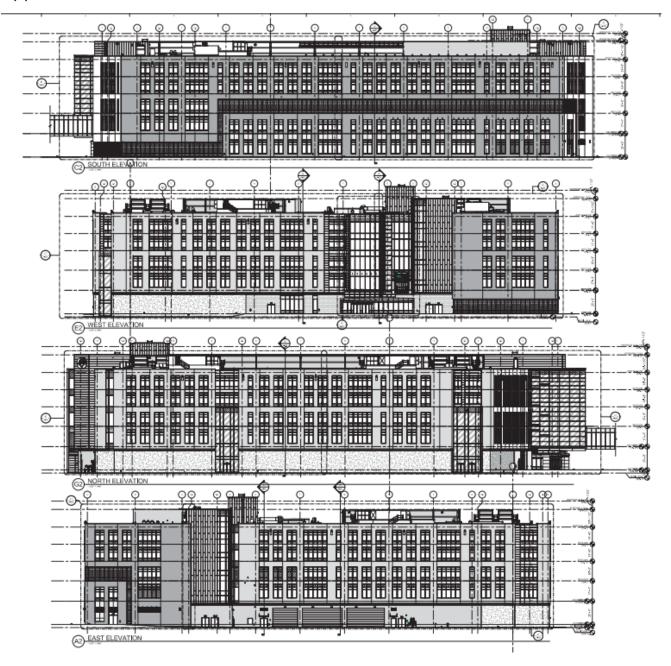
BUILDING ELEVATIONS, FROM TOP DOWN: SOUTH, WEST, NORTH, EAST
